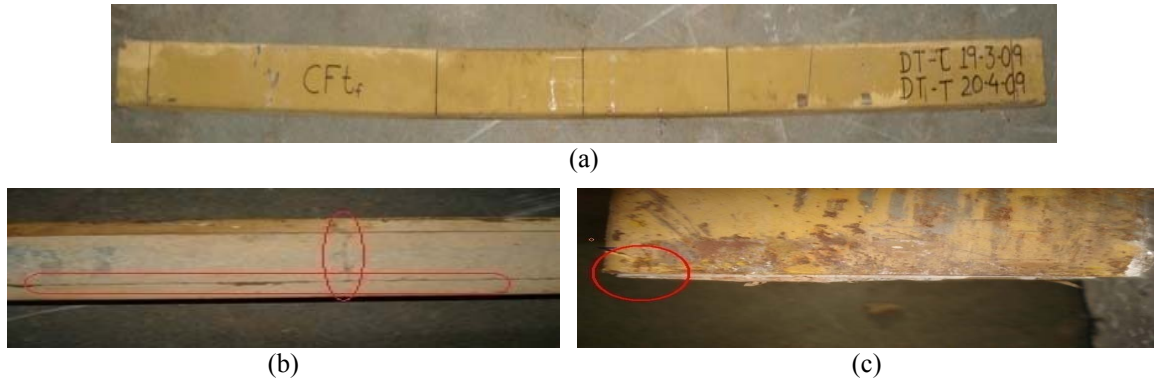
Failure pattern of CFt_f (a) Longitudinal view; (b) Crack and separation of concrete from steel; (c) slip of concrete
